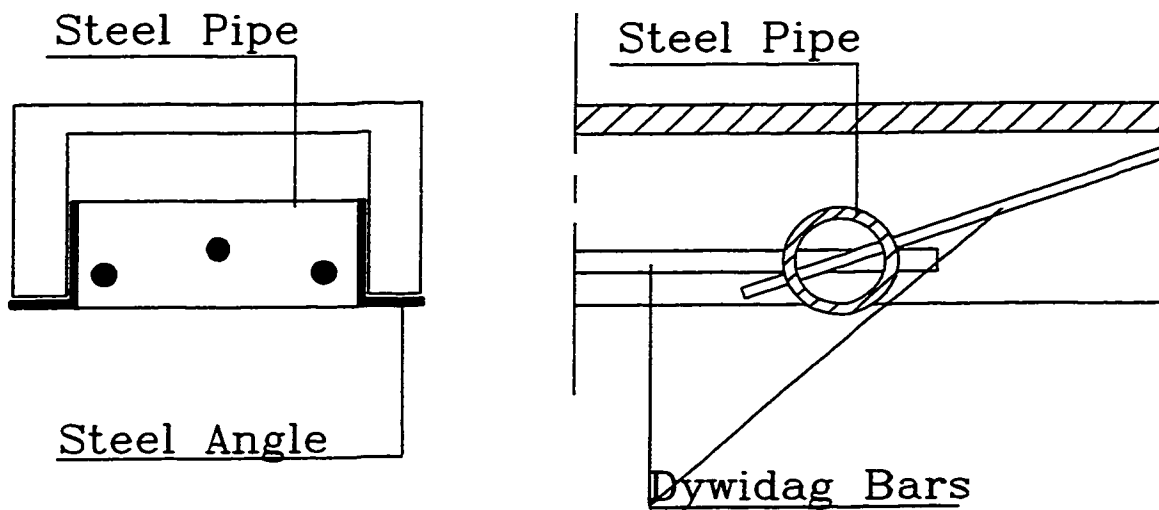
2 Fully- Imbedded Circular Pipes Supported by Welded Steel Angle
